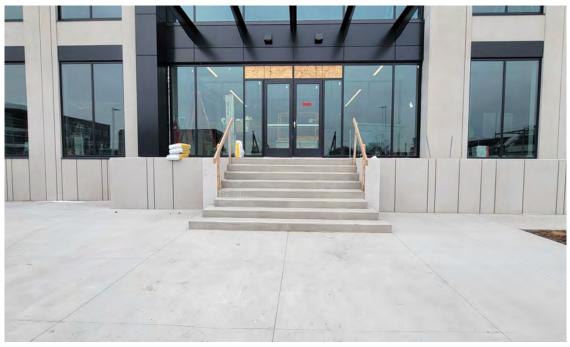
Concrete paved sidewalk and entrance area to the Lot 3 Building A. Concrete plaza space leading up concrete stairs into a concrete slab building. View to north; photograph taken on December 21, 2022.
